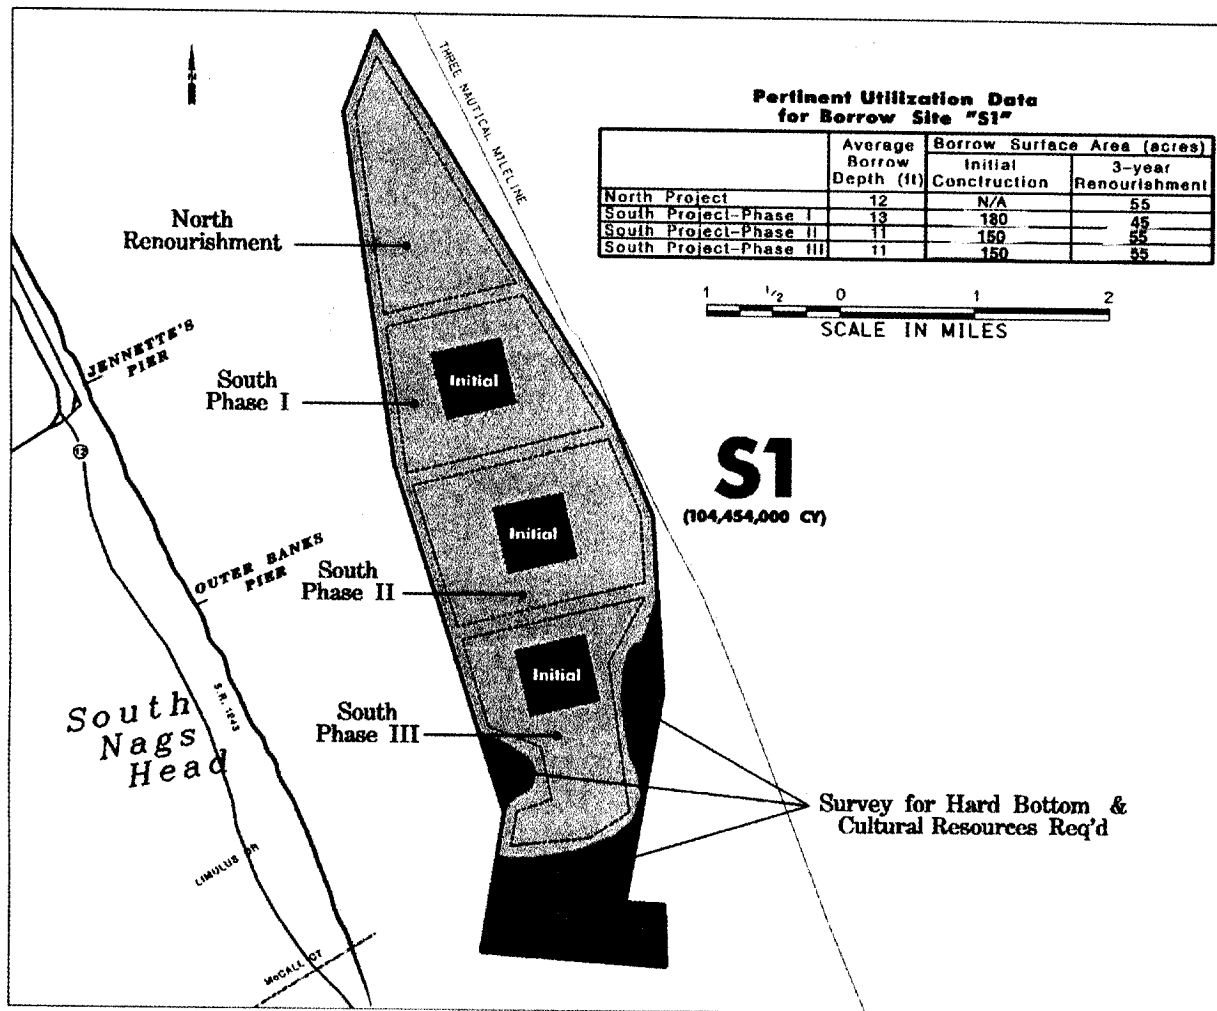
Concept Plan for South Area Borrow Site Utilization
